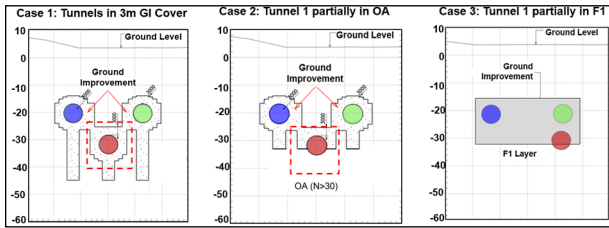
Possible tunnelling scenarios for Tunnel 1.
